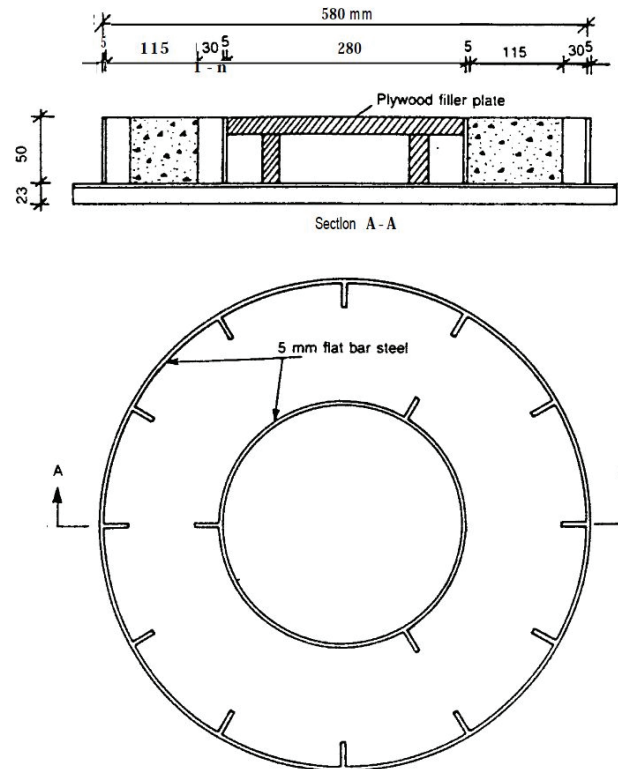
Shrinkage Ring Test Specimen (after NordTest NT Build 433)
